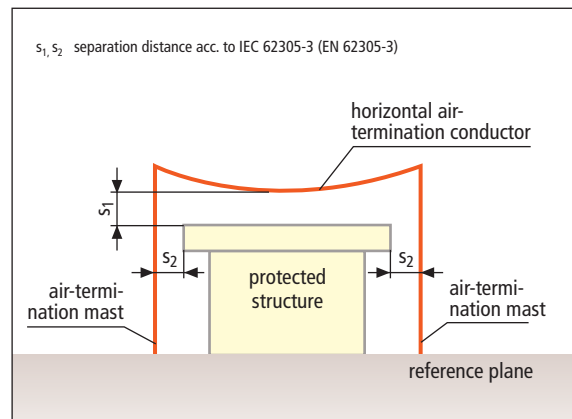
Isolated external lightning protection system, consisting of two separate air-termination masts, connected by a horizontal air-termination conductor: Projection on a vertical surface via the two masts (vertical section)
